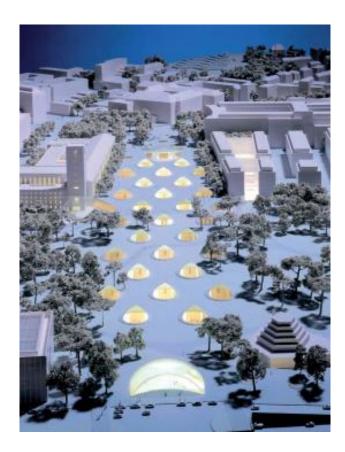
The proposed ground level of the underground Stuttgart Main Station which is left as a green area for the citizens (Source: www.ssb-ag.de. Last accessed on 09.03.2010)
